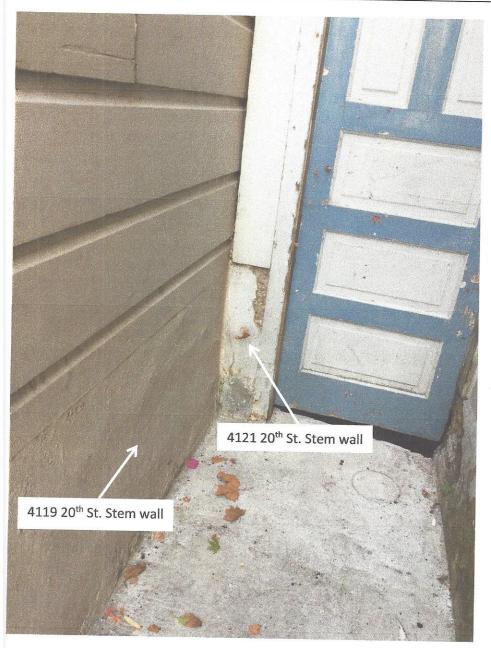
indicates 4119 20th St. and 4121 20th St. footings are most likely the same elevation. Proposed basement finish elevation is 2 feet lower than walkway existing elevation. Detail 1/S-2 represents actual site condition.
